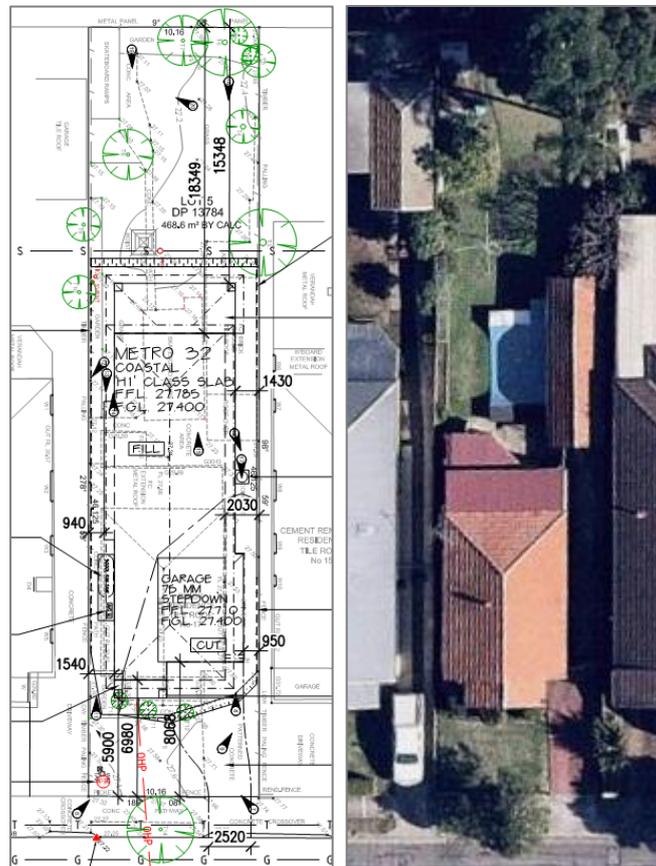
Illustration of proposed site plan in comparison with existing site plan
